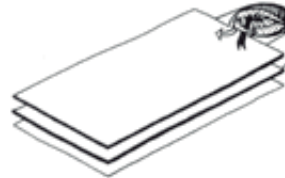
Three-Level Staggered Floor Ramp System.
